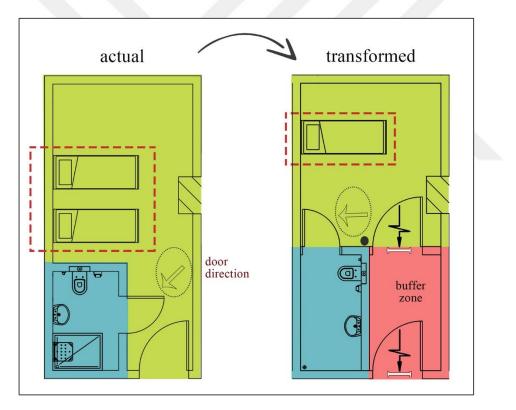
Transformation of Rooms Located on 2. and 3. Floor
